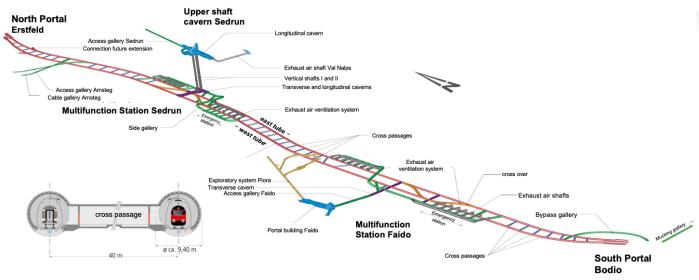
Tunnel System Gotthard Base Tunnel (Source: Amberg Engineering, STS 2016)
